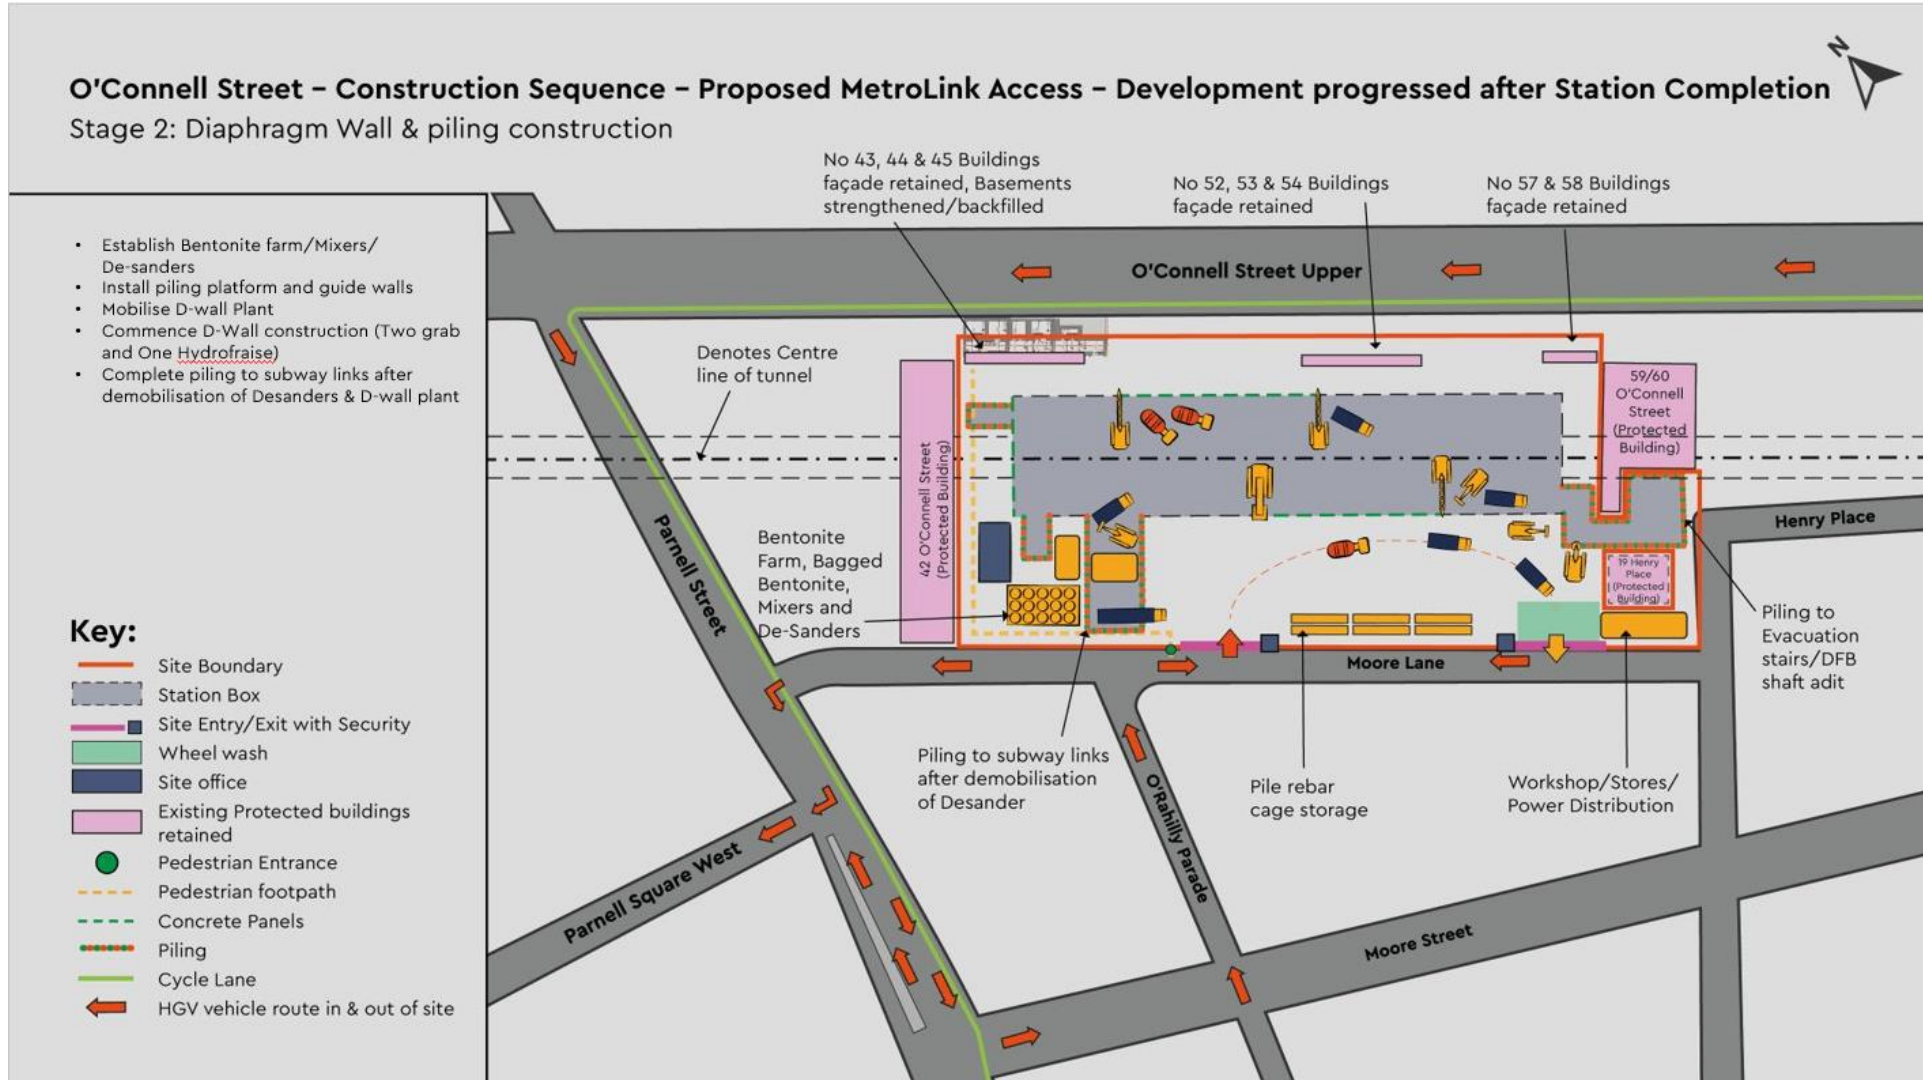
O'Connell Street Stage 2 – Diaphragm wall & piling construction
